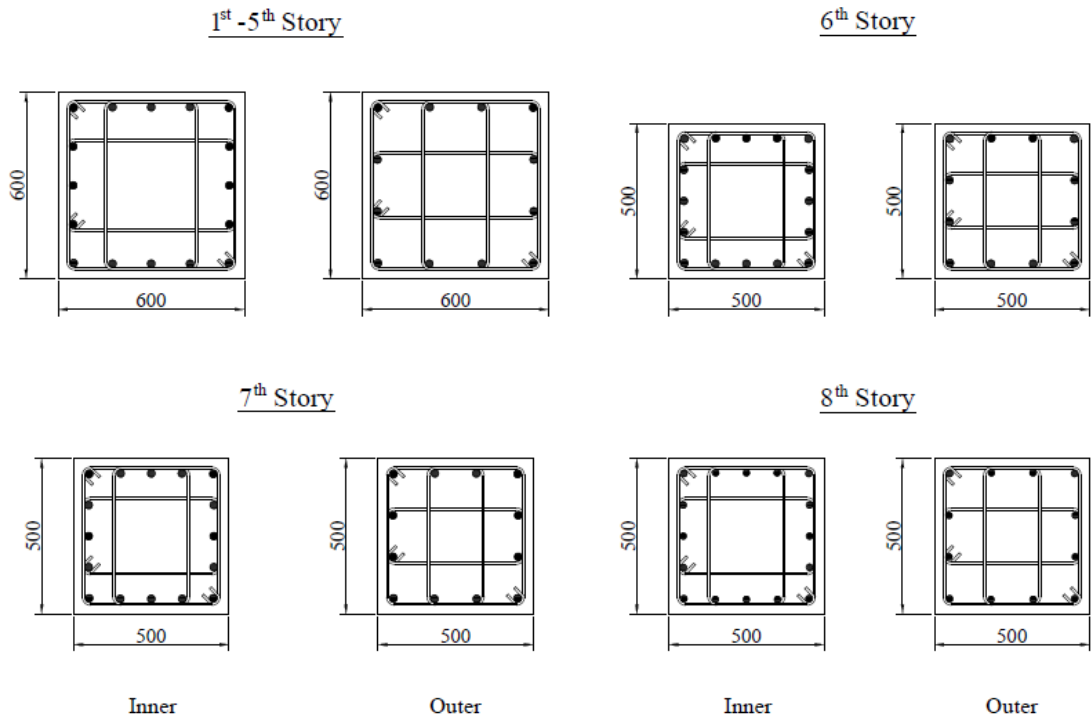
Cross Sections for Columns of 8 Story Irregular Frame
